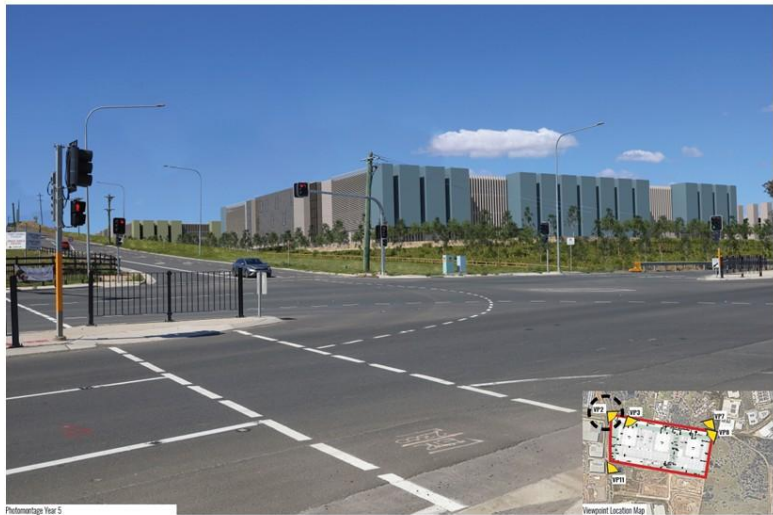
Viewpoint 7 - Mamre Road & Bakers Lane Intersection, Kemps Creek - Looking Southeast (Photomontage Year 5)
